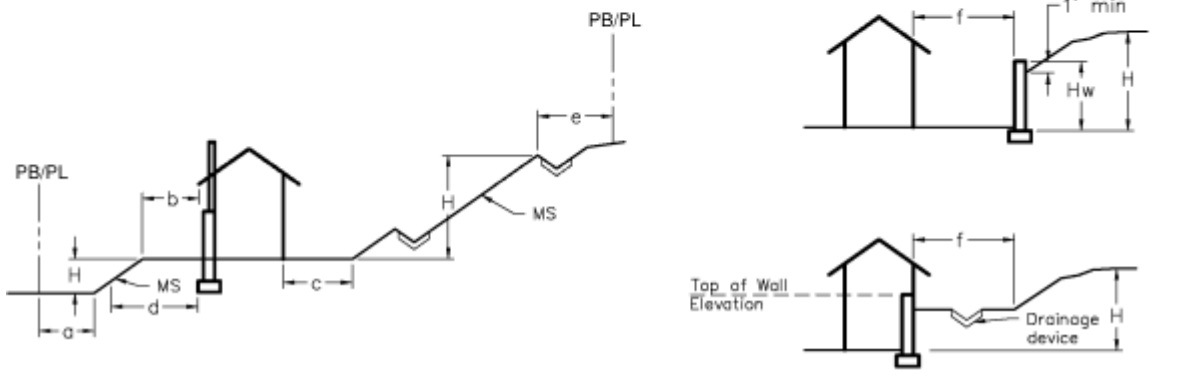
Minimum Setbacks from Adjacent Slopes
